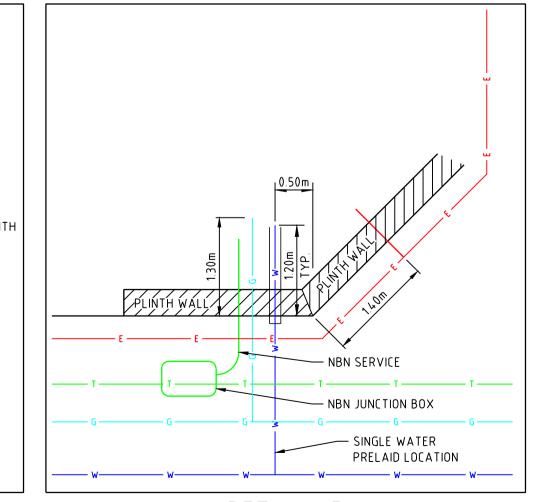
TYPICAL SERVICE LOCATIONS PLAN
